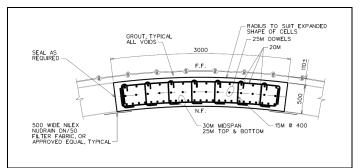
Typical Section of Precast Ice Strengthening Panel
